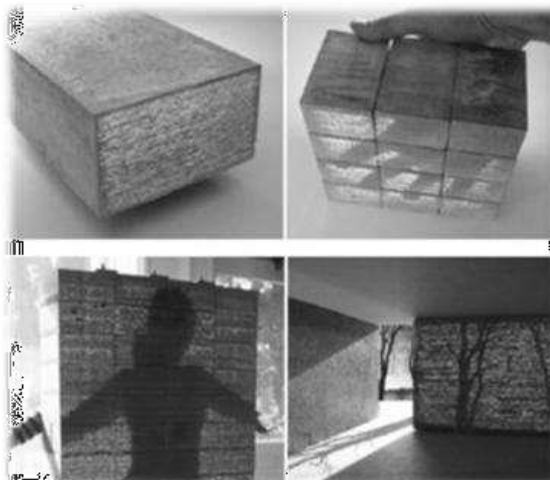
TRANSLUCENT CONCRETE IN USE
